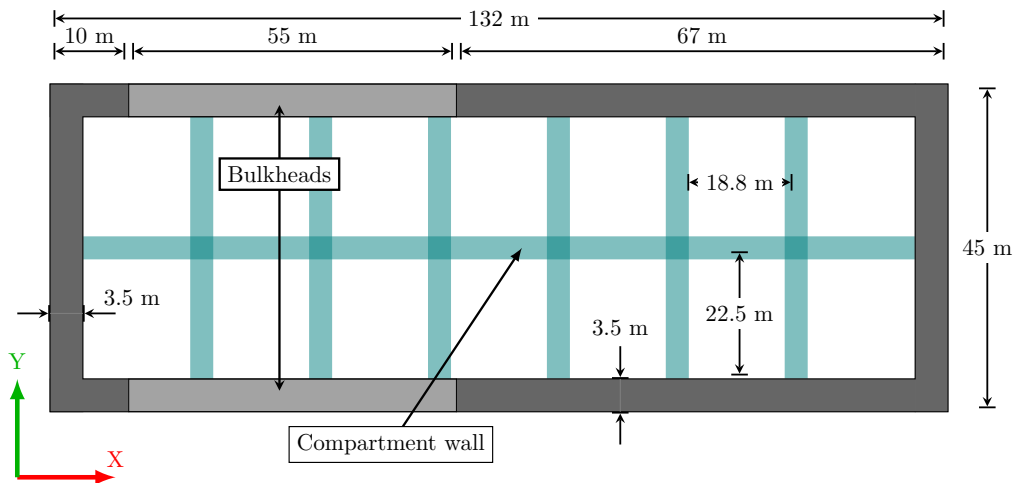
Plan view of one large caisson. The caisson is divided in multiple compartments
